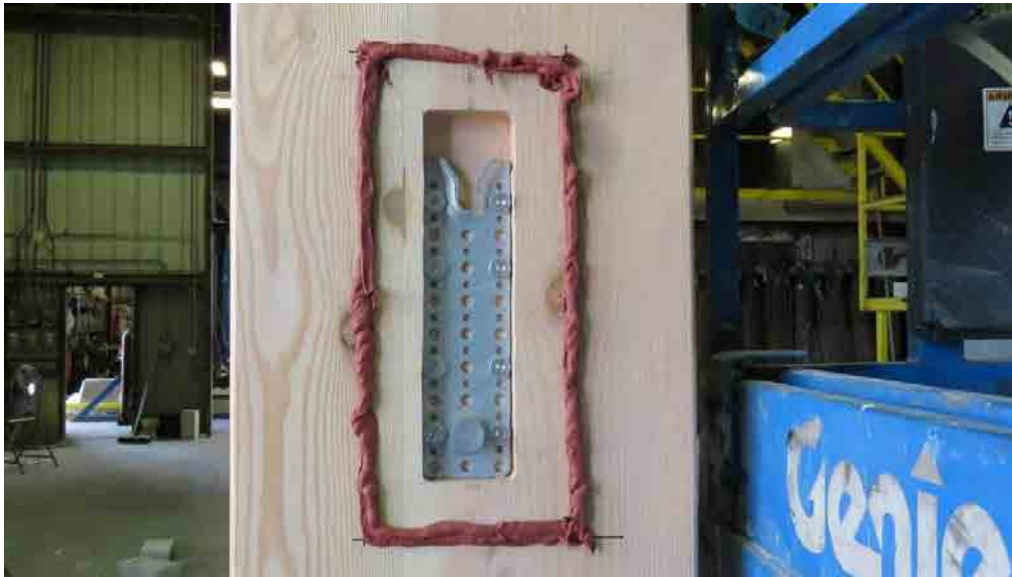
Test 1 fire sealant in place prior to connection of beam
